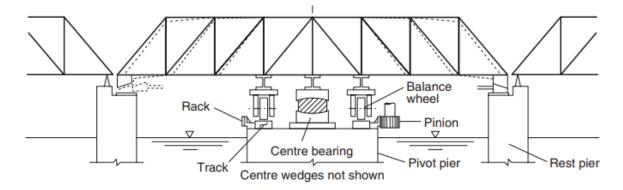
Center bearing swing bridge (Ryall et al., 2003)
